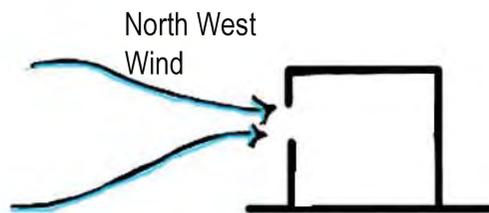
,3 WINDOWS ARE ALL DIRECTED TO THE PREVAILING NORTH WEST FAVORABLE WIND
